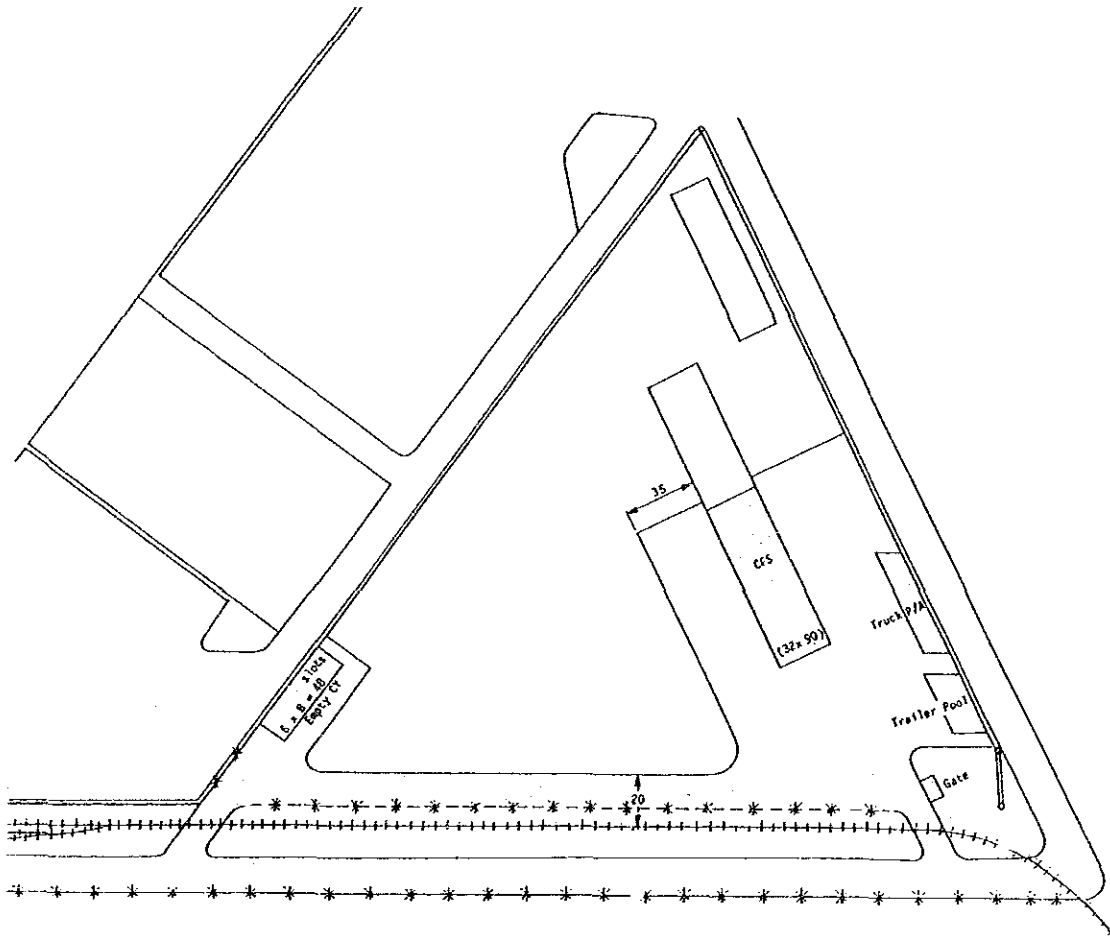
Layout Plan of CFS Area (Port of Lazaro Cardenas : 1995)
